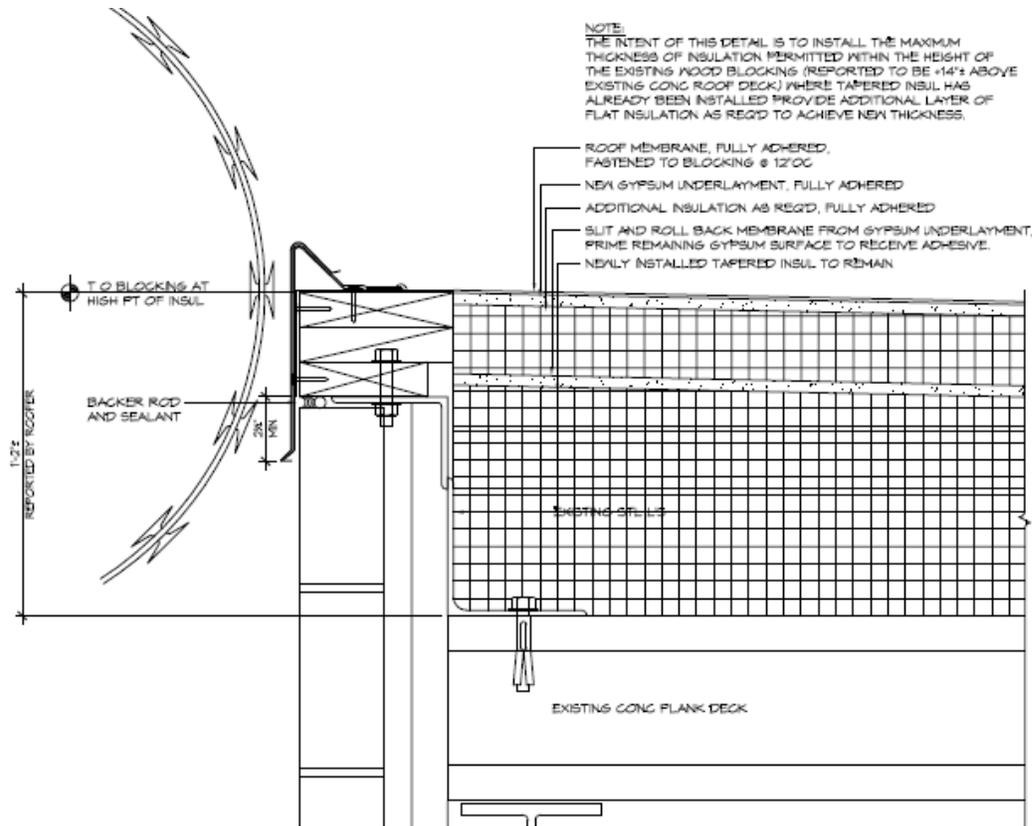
Roof Edge Detail for Unit 4 with 14 Inches of Insulation
